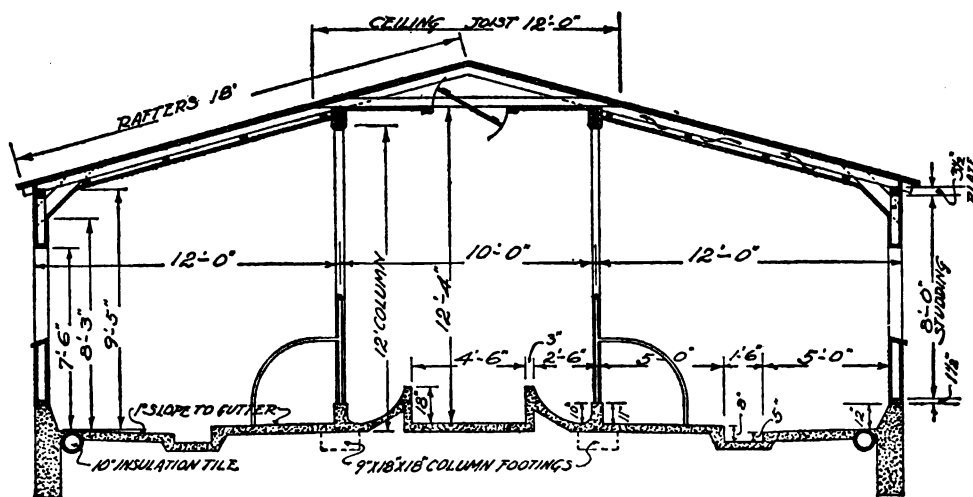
Section of a single-story dairy cattle barn with concrete floor, metal interior equipment, double walls providing ventilation flues. It is arranged so that the cows face inward toward a central feeding alley. (See Chapter 34 for advantages and disadvantages of this plan.)
